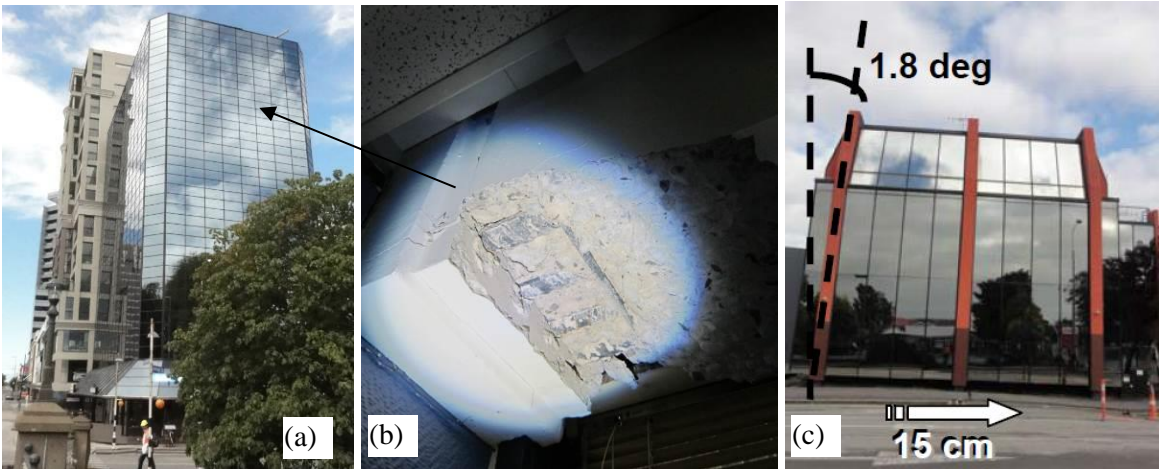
Building Foundation “Failure”: a-b) 1980s high rise on basement and raft foundation; with beam plastic hinges observed throughout the building ; c) 1980s low rise on shallow foundation with significant differential settlement and sliding movement (photo from Cubrinovski and McCahon, 2012).
